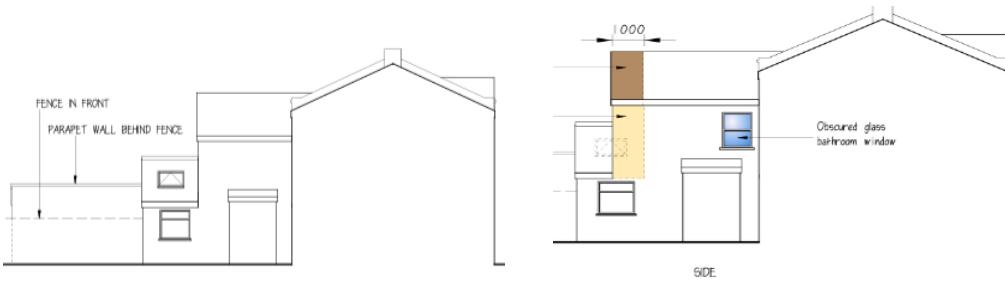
Existing side plan (left) and proposed side elevation plan (right)
